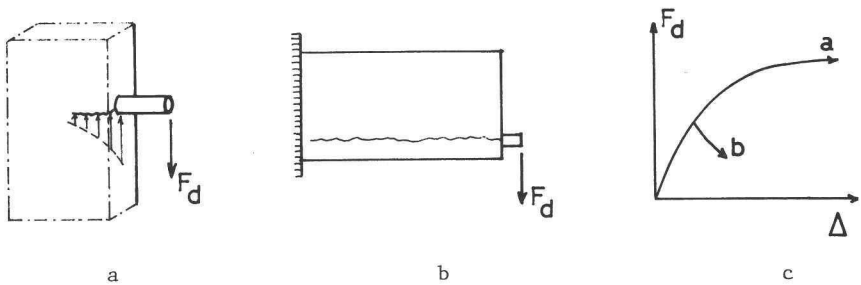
a,b: Dowel cracking in a planar structure and in a beam
